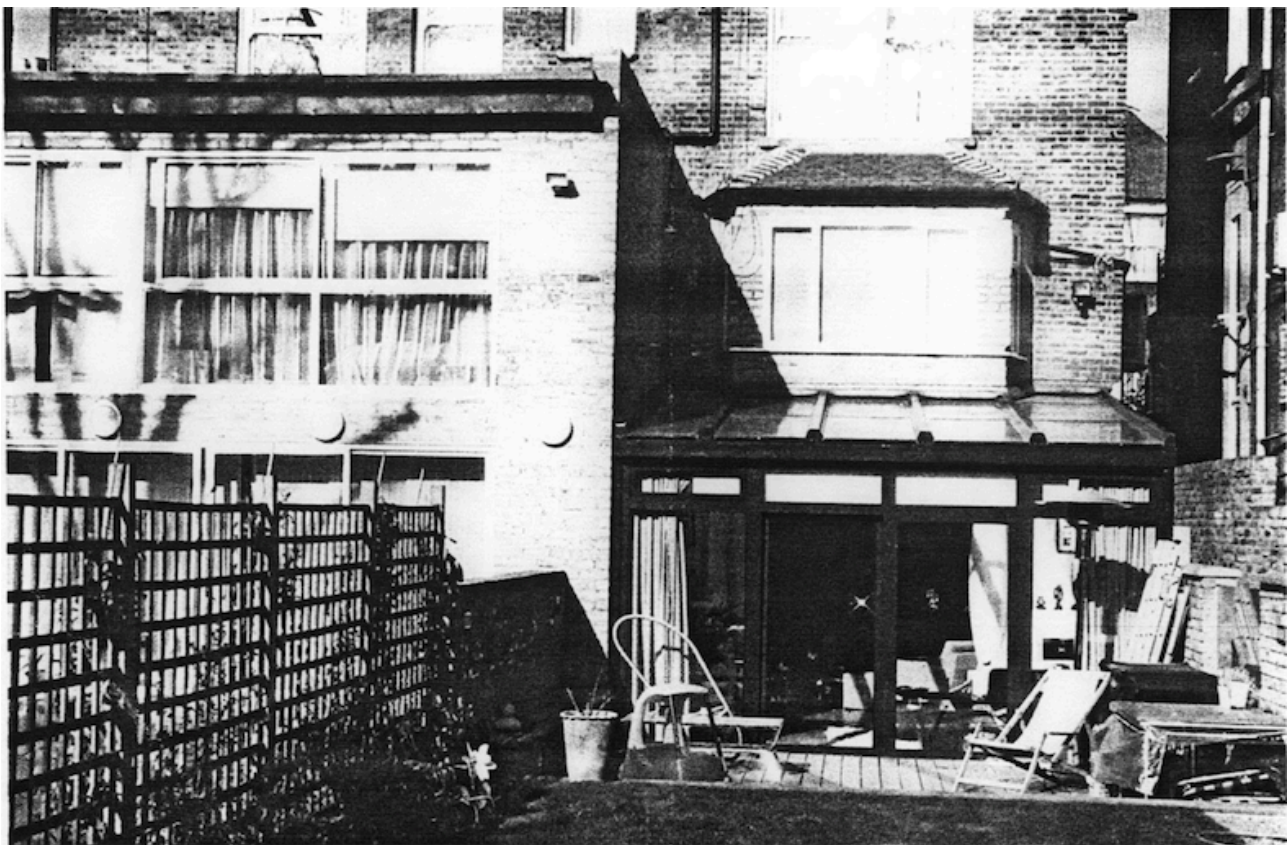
PHOTO OF REAR ELEVATION FROM APPLICATION 2008/0996/P AT NO. 113 CANFIELD GARDENS
